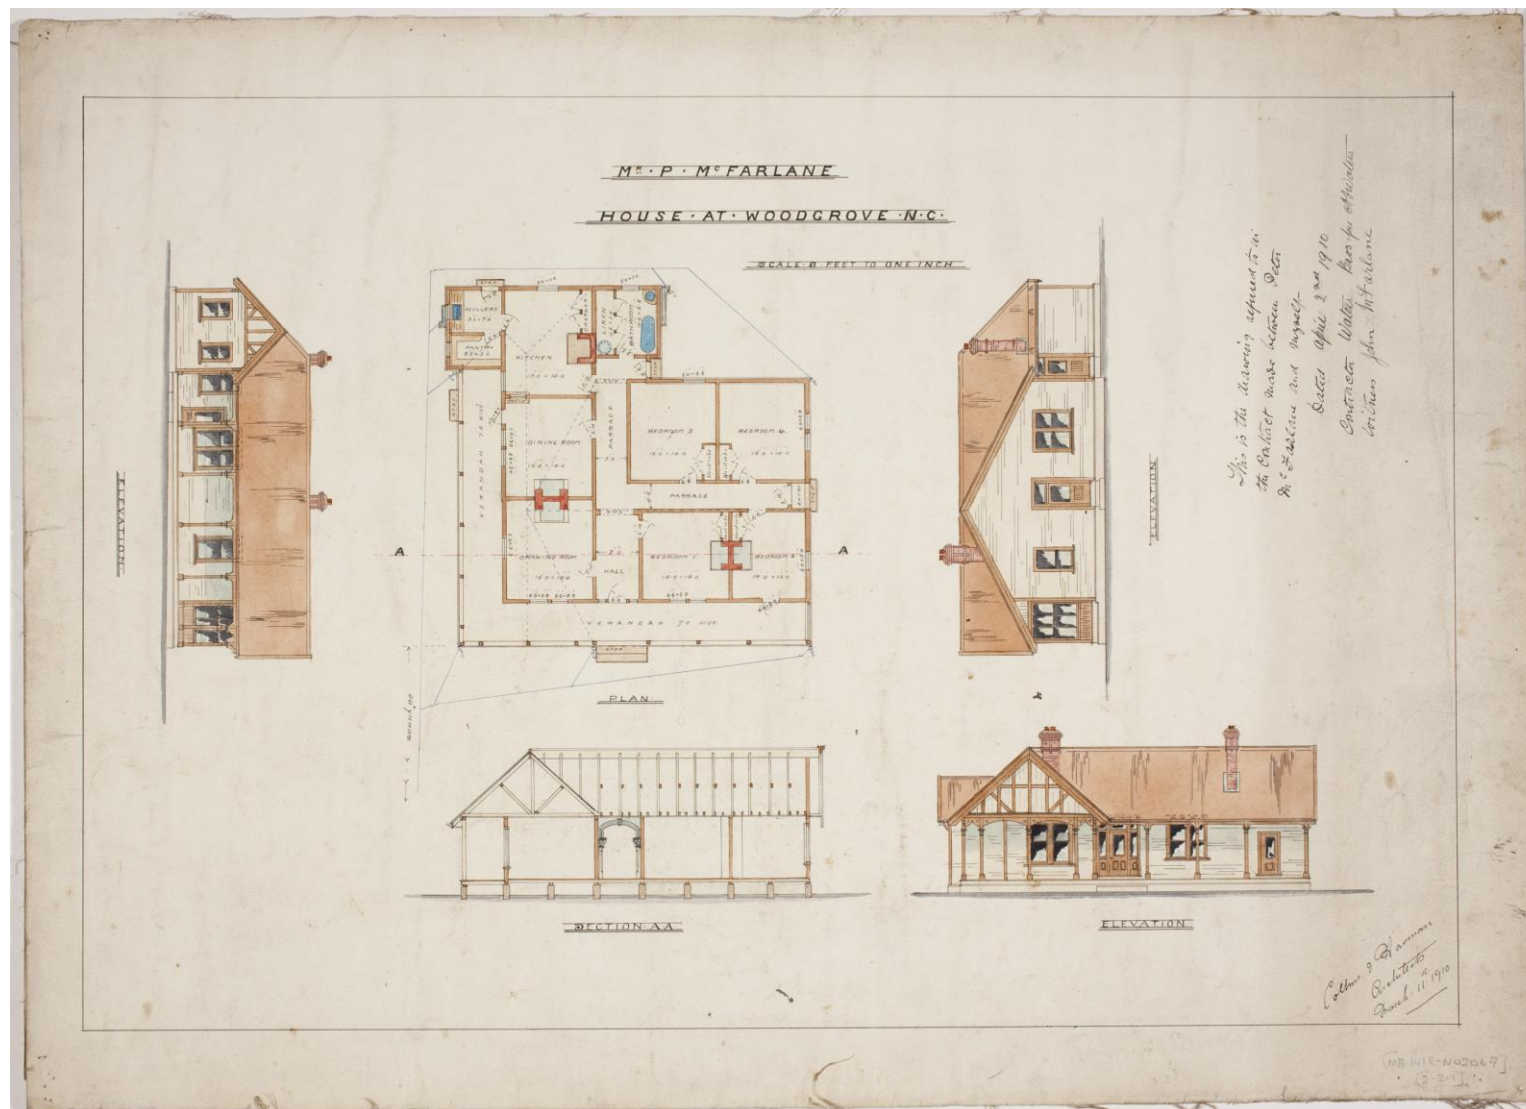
Collins and Harman, Mr P. McFarlane, House at Woodgrove, N. C., plan, elevations and section (1910).
